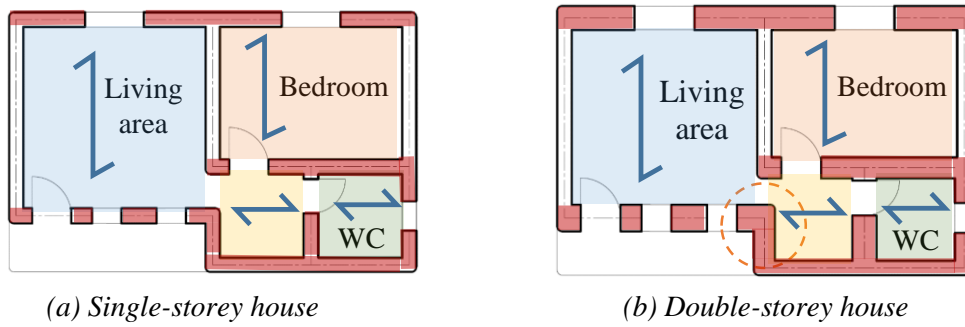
Floor plan showing the minimum required wall sizes walls to scale. (Shown for pattern type A for illustrative purposes)
